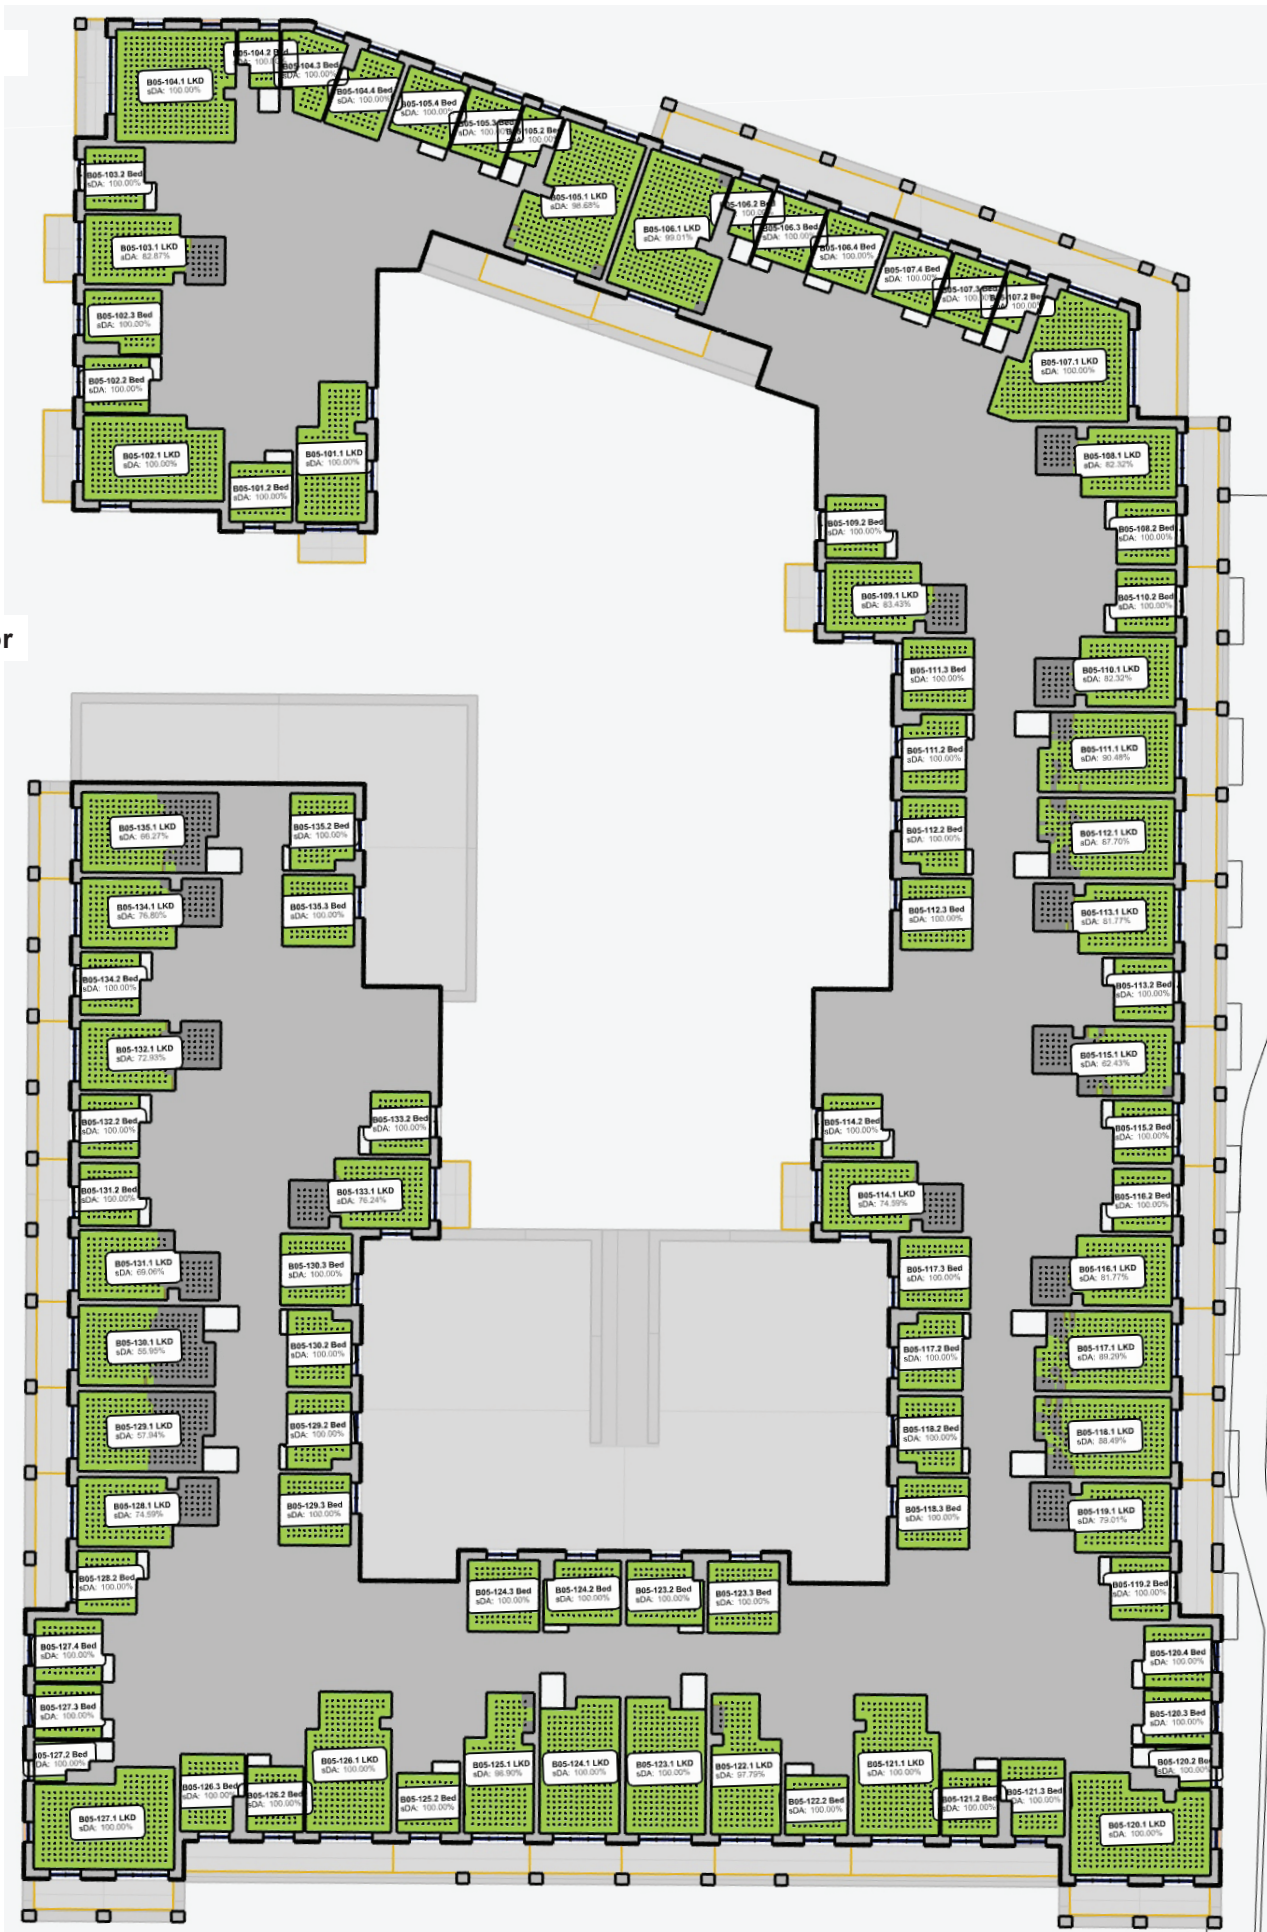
Site 5 - Floor plans indicating Daylight Provision to BS EN17037:2021+A1 Table NA.1
